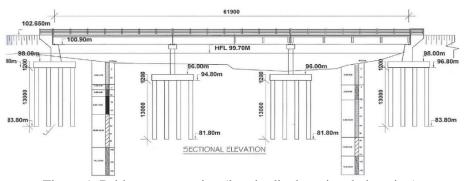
Bridge cross-section (longitudinal sectional elevation).
